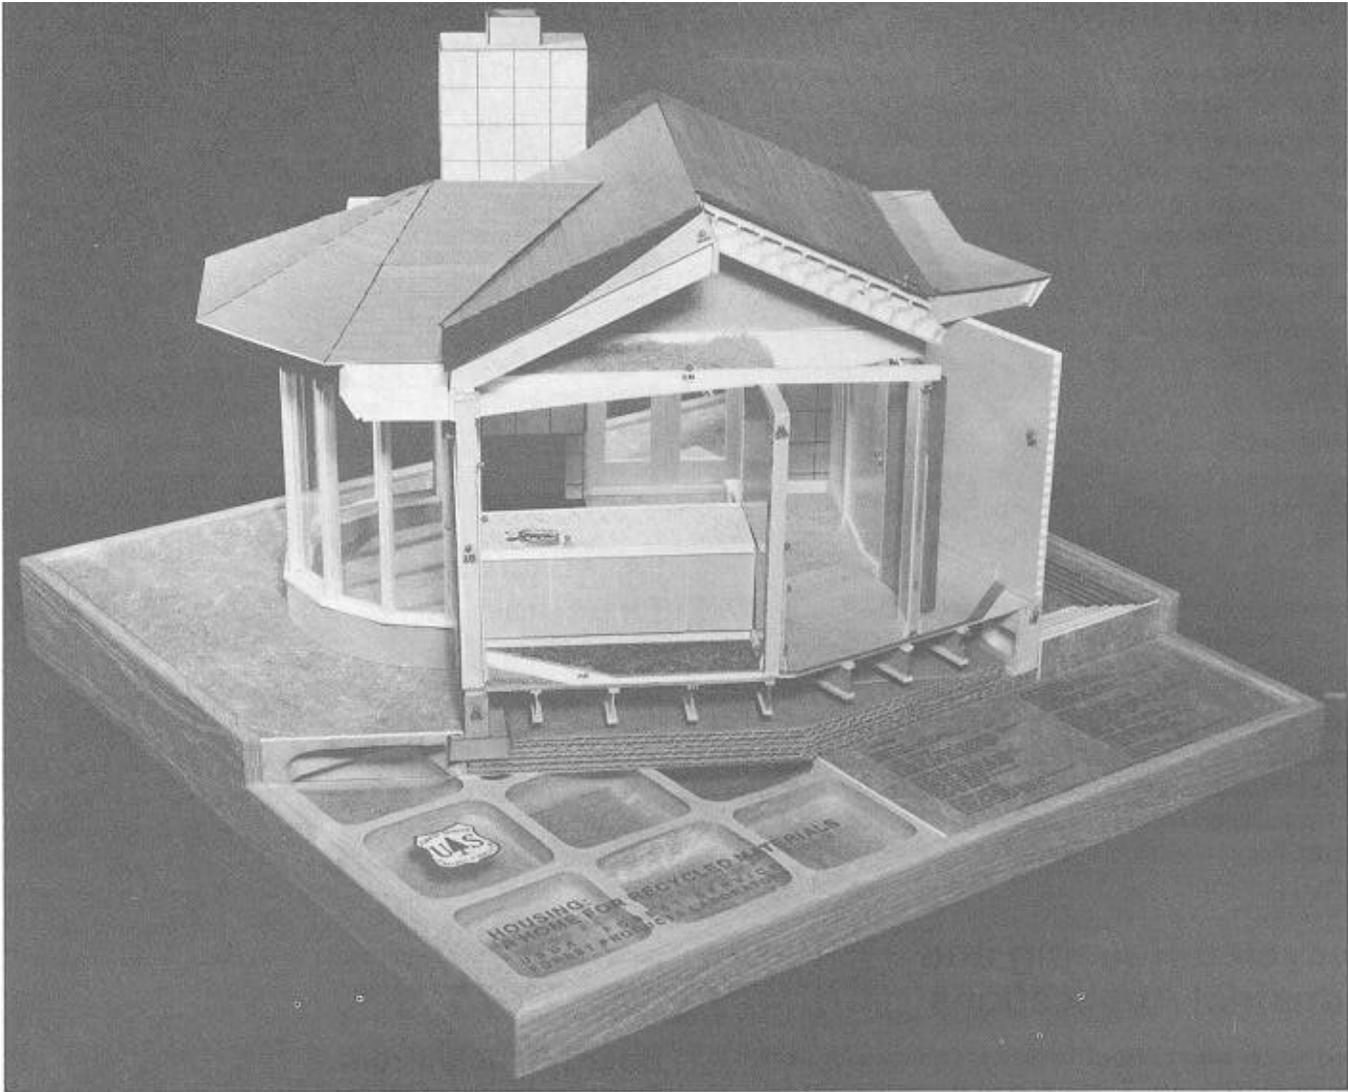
This model house demonstrates some potential uses for recycled materials in building products of the future. Recovered paper and wood could be used in everything from shingles and roof panels to wall studs and floor joists
